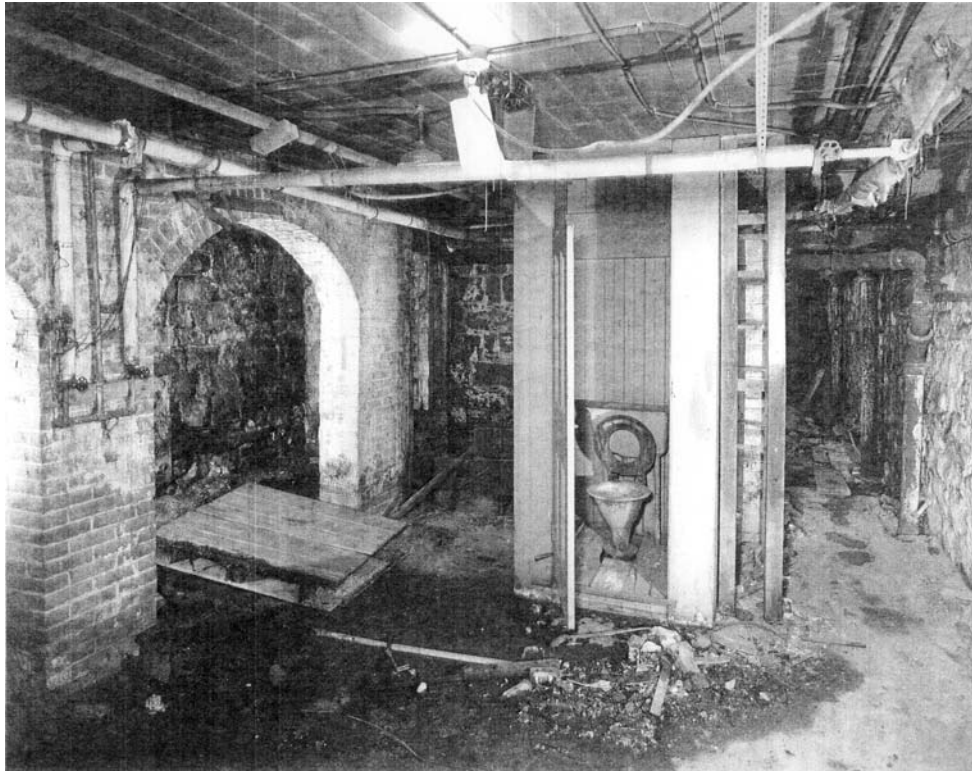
Interior view of Area F, 114 S. Front Street, Room B, view west of c.1892 water closet that drained into Feature 2 (below pallet). Note brick arches at left, built c.1856 to support one-story counting house. The stone walls of Room B formerly enclosed an open yard at cellar level (Photograph by George Eisenman in Batcheler 1978).
